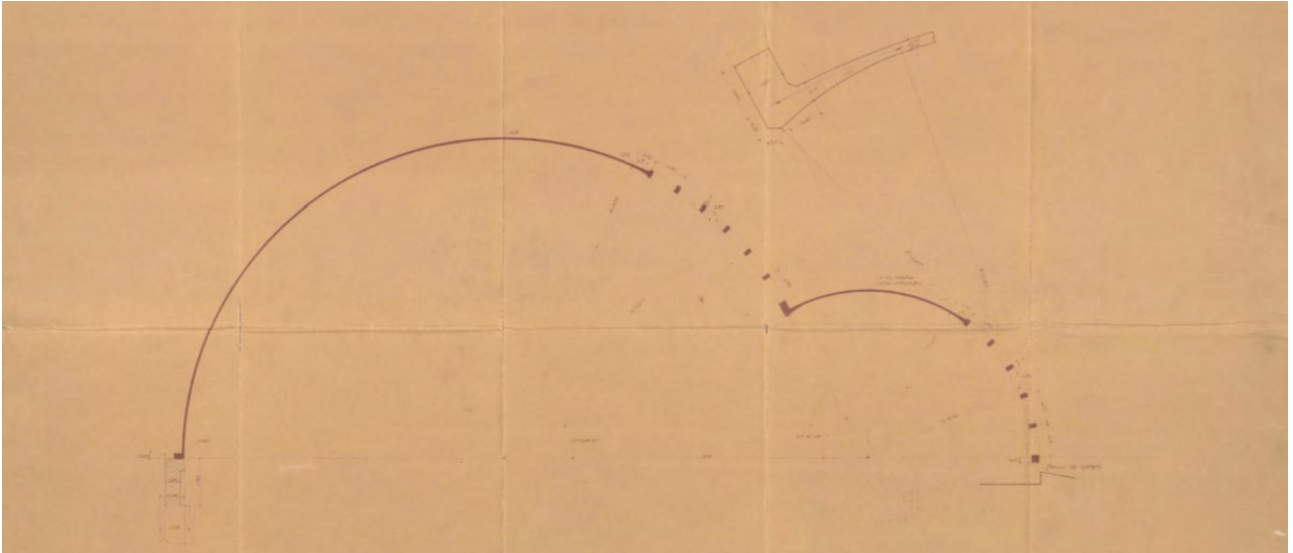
Frontón Recoletos: cross-sections of the roof. Concrete and reinforcement drawings [Archivo Digital Torroja, CEHOPU-CEDEX].
